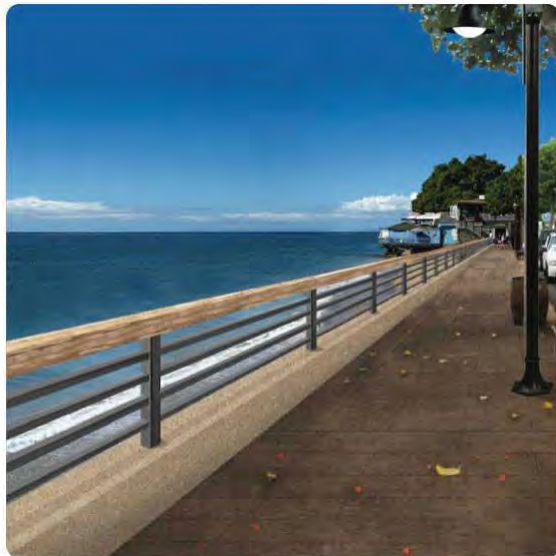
Conceptual sketch for seawall and sidewalk reconstruction at Area1 of seawall.
